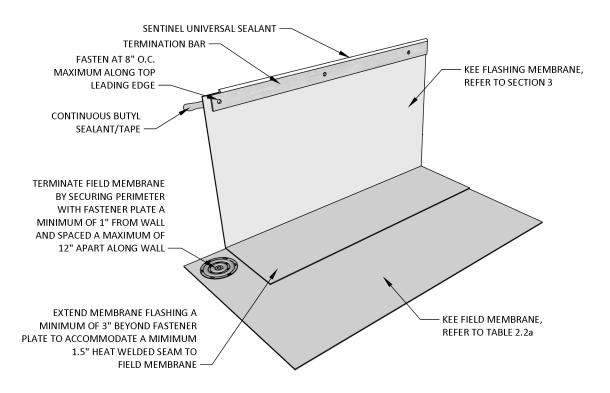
Mechanically Fastened KEE Field Membrane at Wall/Curb with Horizontal Perimeter Fastening
